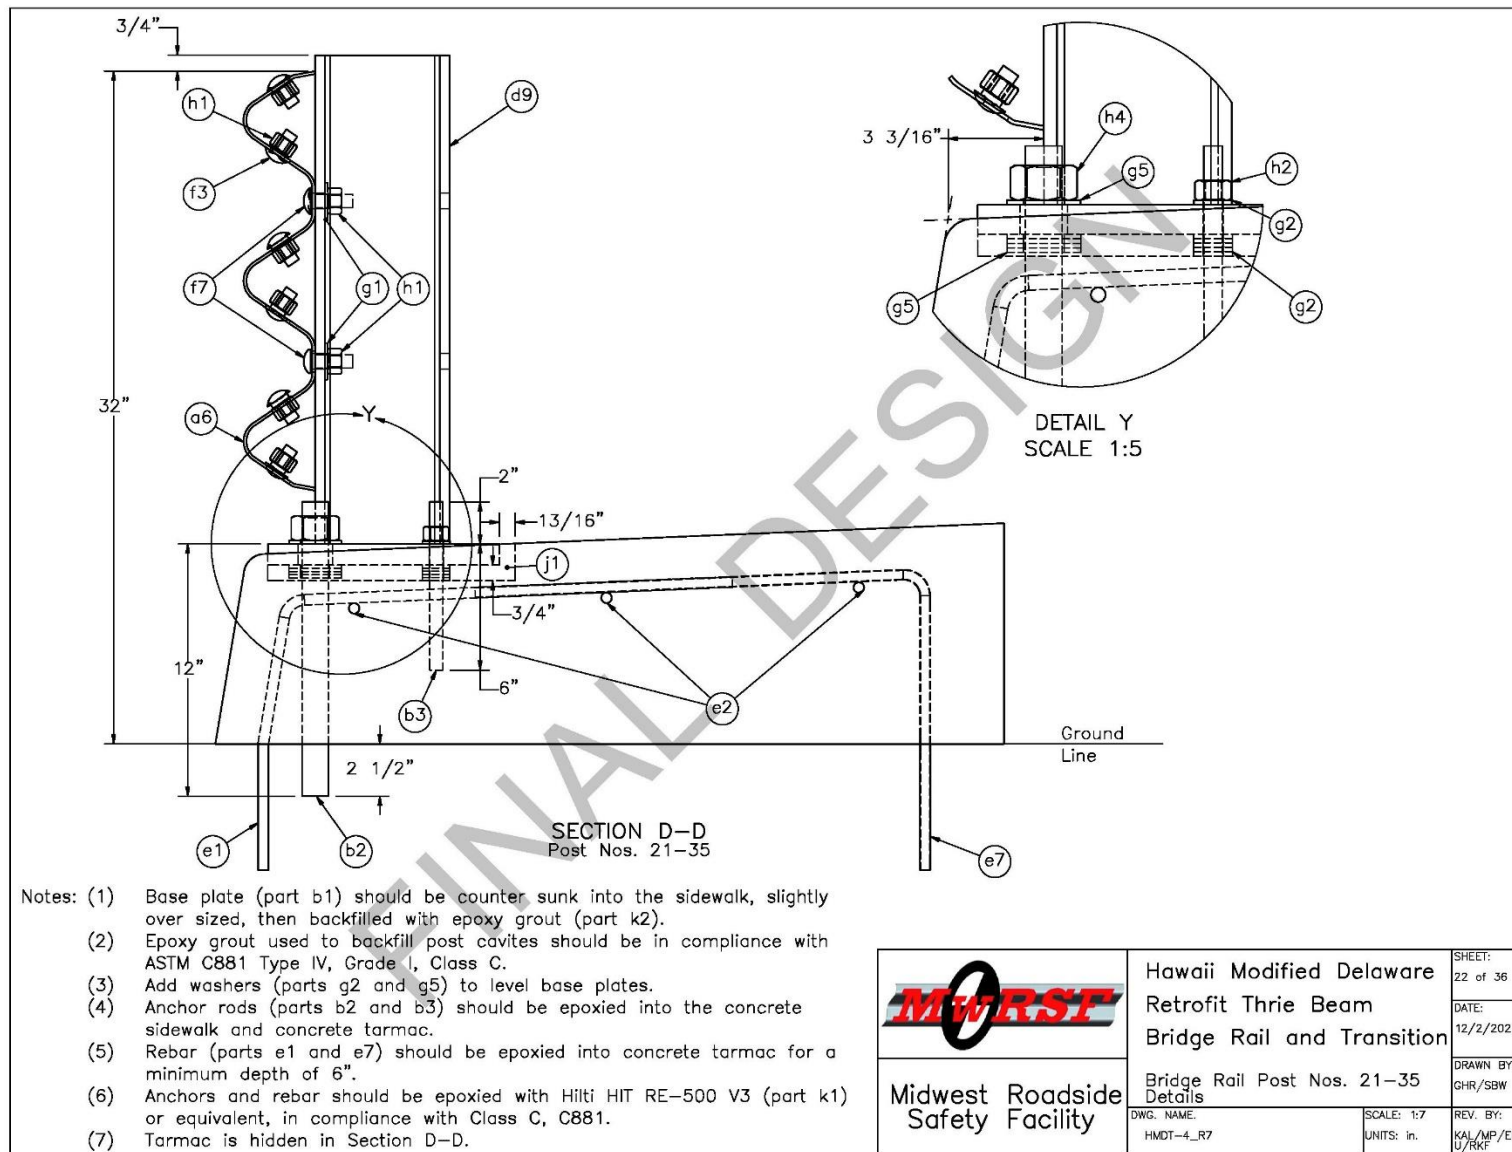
Bridge Rail Post Nos. 21 through 35 Details, Test No. HMDT-4
